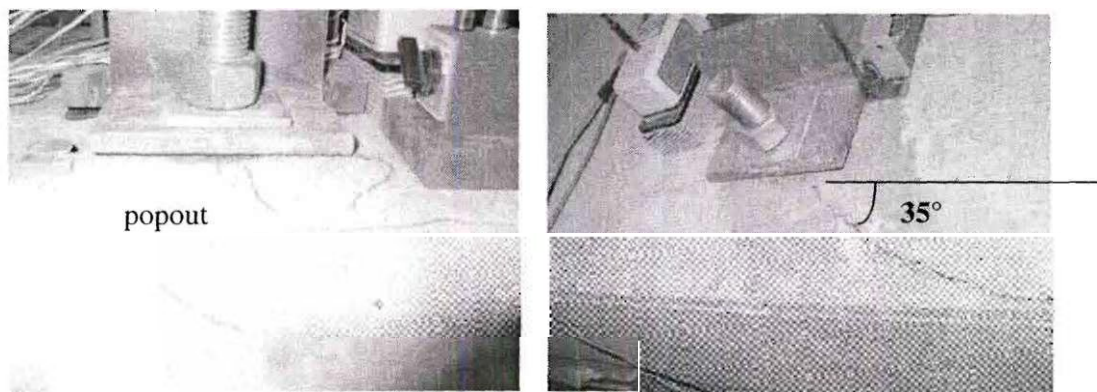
Failure surface with diagonal crack of 35° revealing concrete breakout strength
